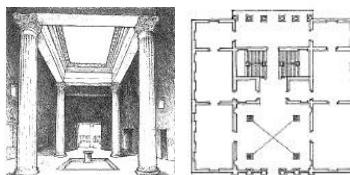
a) The four columns not only supported the vaulted ceiling, and the floor above but also adjusted the dimensions of the rooms to Palladian proportions.
